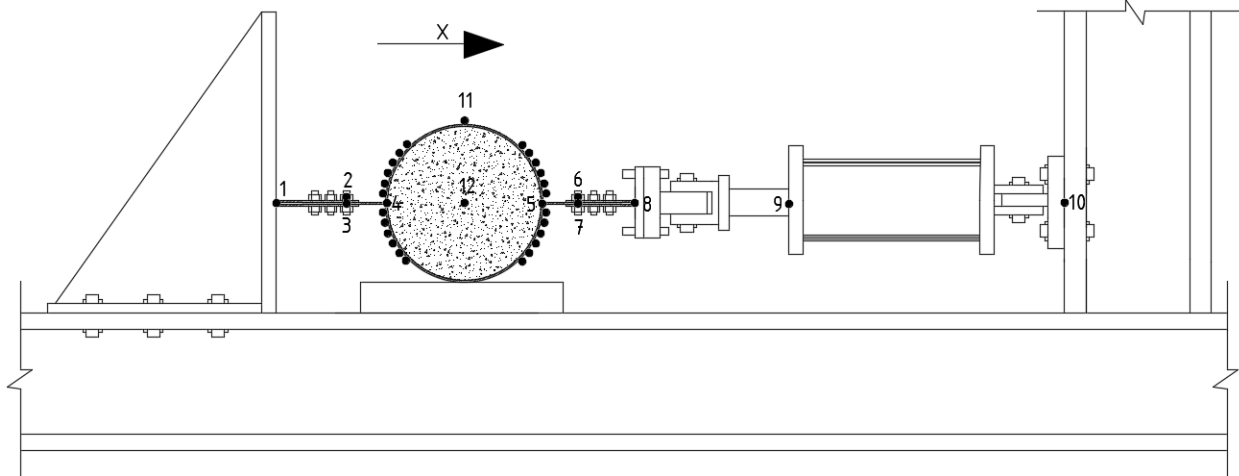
LED layout in the concrete-infilled CHS specimen test set-up
